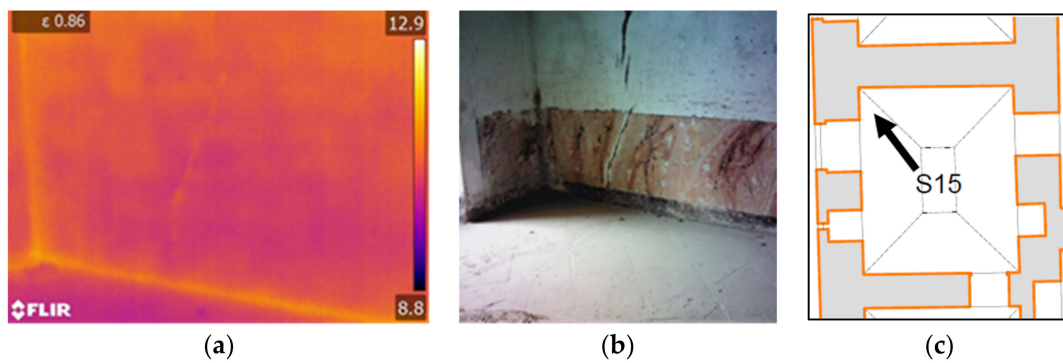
Room S15: (a) infrared image, (b) photography view and (c) plan view.
